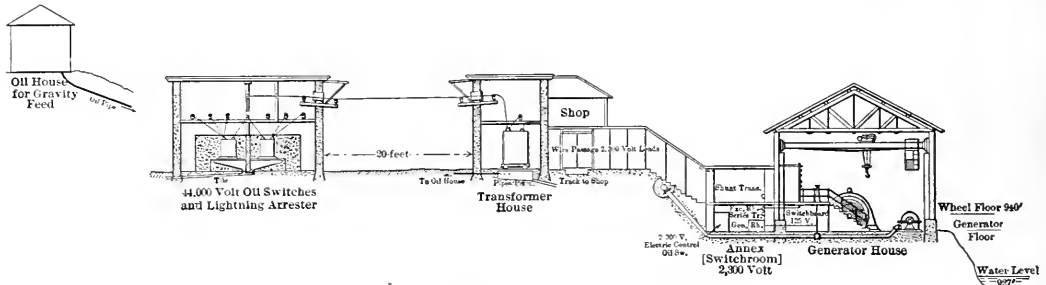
CROSS-SECTION OF ELEVATION GENERATING STATION AND MAIN BUILDINGS.
